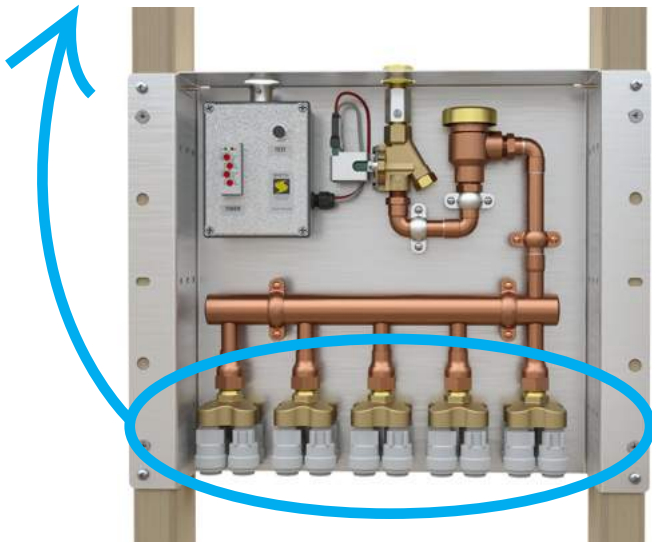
SM SERIES: Multi-port outlet assembly designed to prime from 26 to 32 floor drain P-traps. Designed to interface with Building Management System. Hardwired connection.
